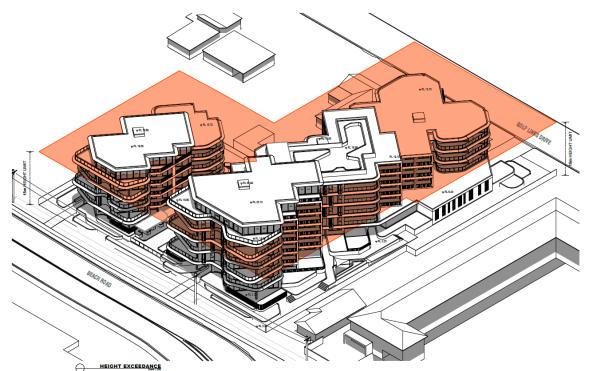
Diagram showing 15m height plane across the site. Building A right, Building B left. Clause 4.6 – Exceptions to Development Standards
